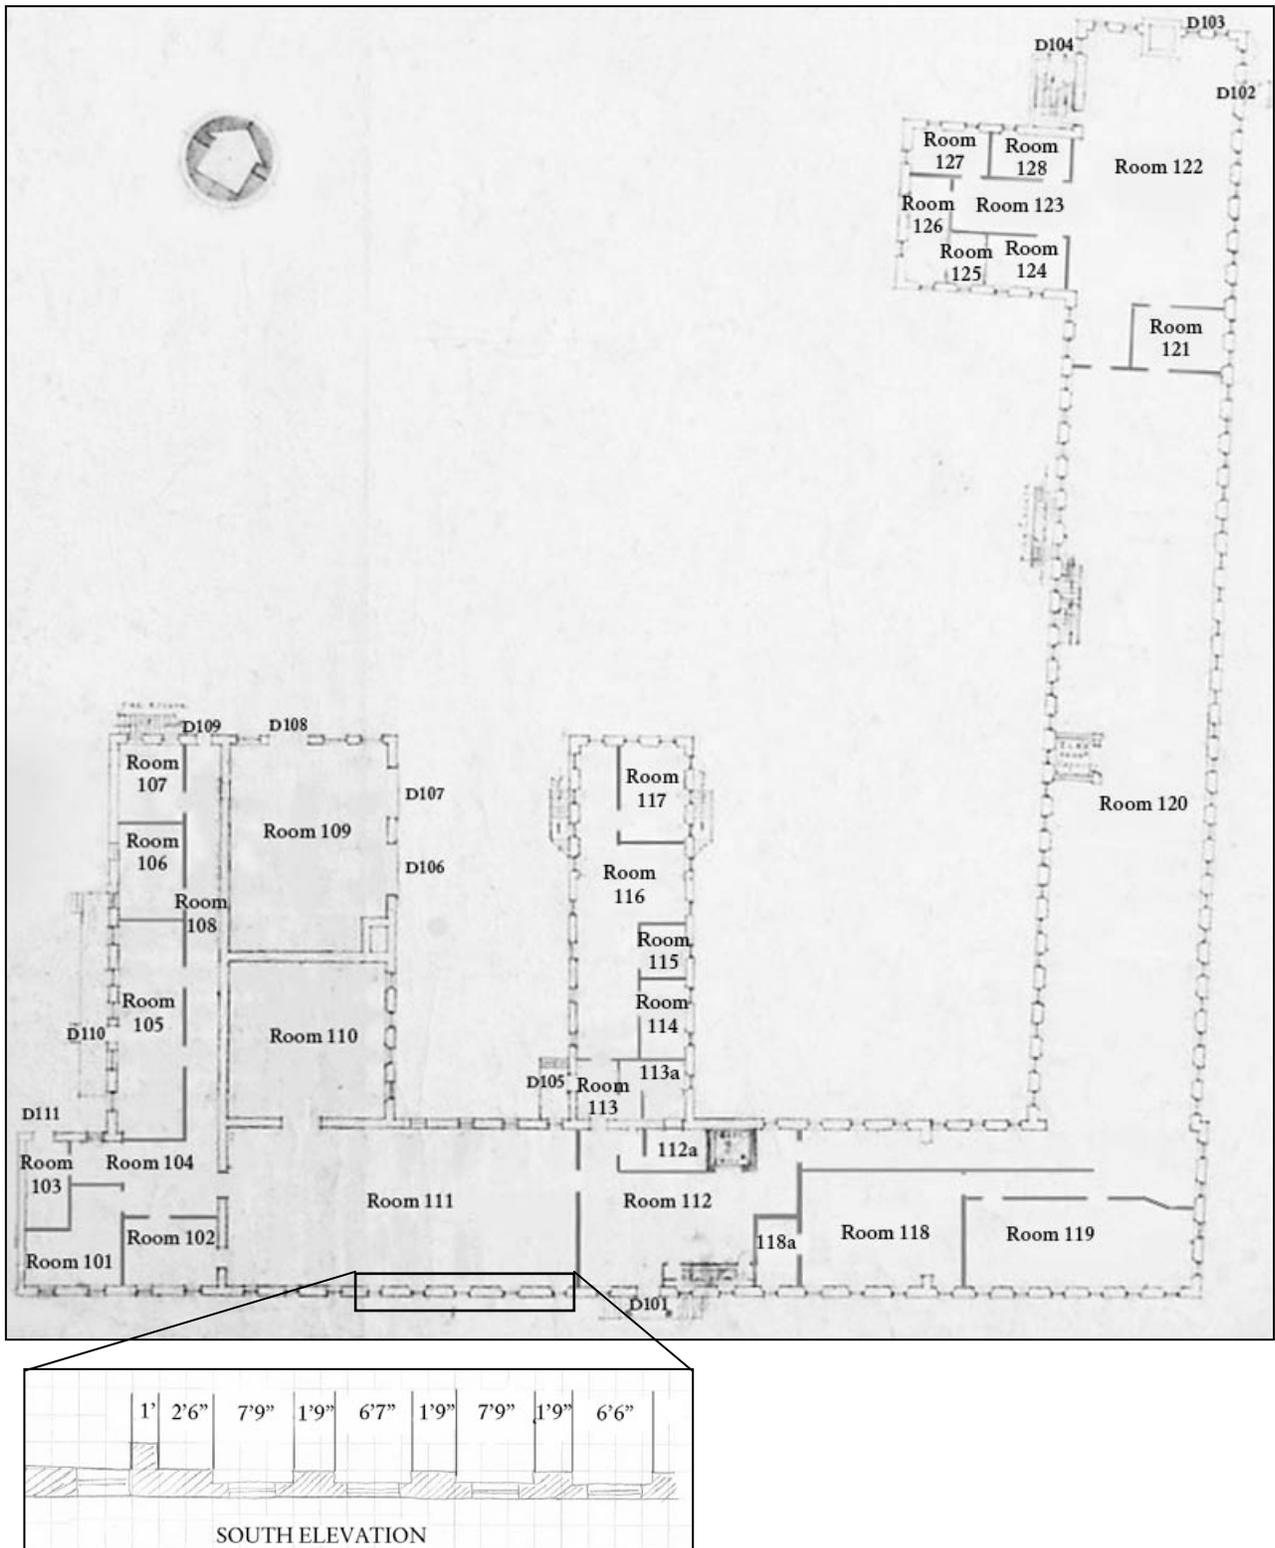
Building 27 first floor plan, with room numbers assigned for current project. Plan copied from 1941 drawing (fig. 54) with more recent partitions added; not to scale. Inset: Detail of south wall in Room 111 showing stepped wall and window niches.
